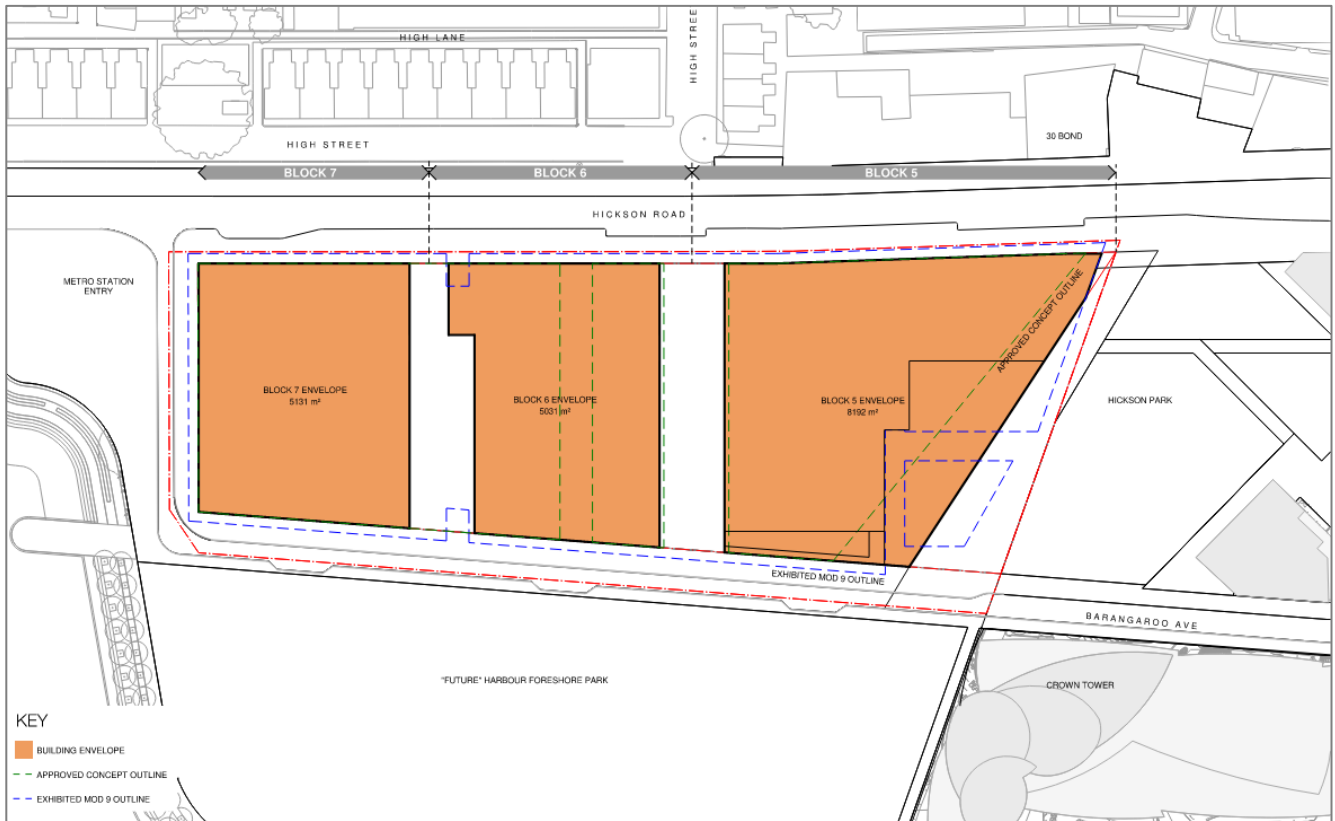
AMENDED ENVELOPE AND BLOCK LAYOUT (SJB)
